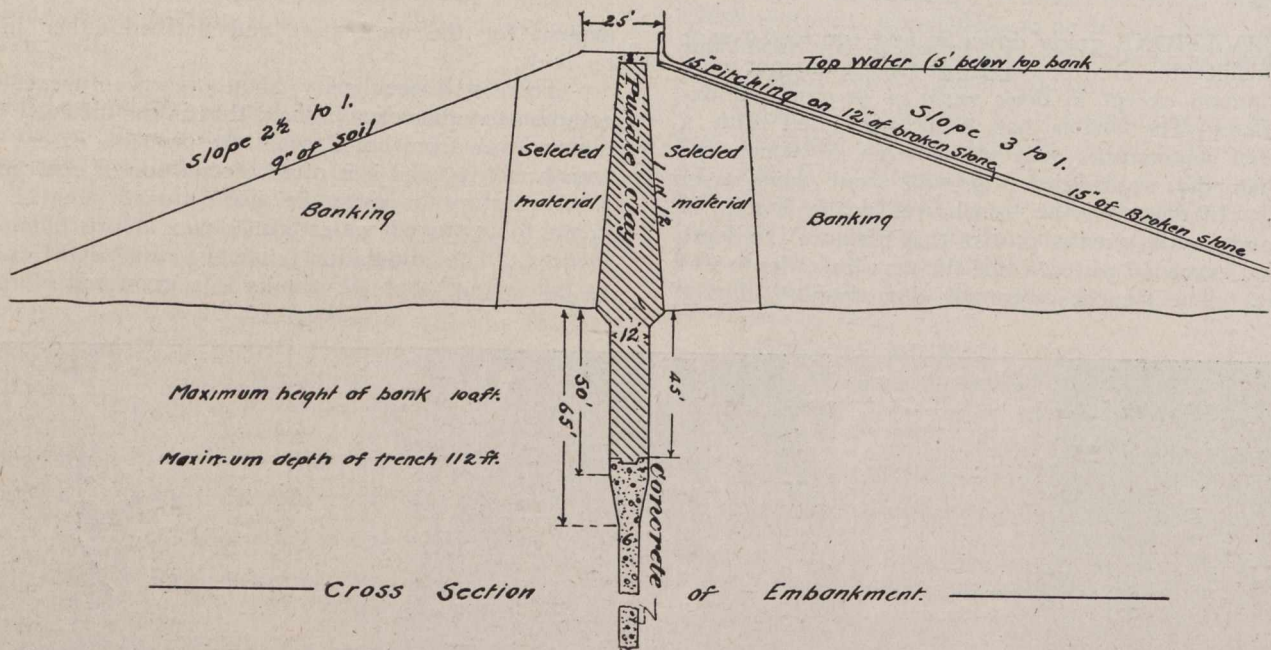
Cross-section of a Reservoir Embankment, Showing Core Wall of Concrete and Puddle Clay.
